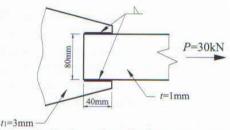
Lap side welded strap-to-gusset
